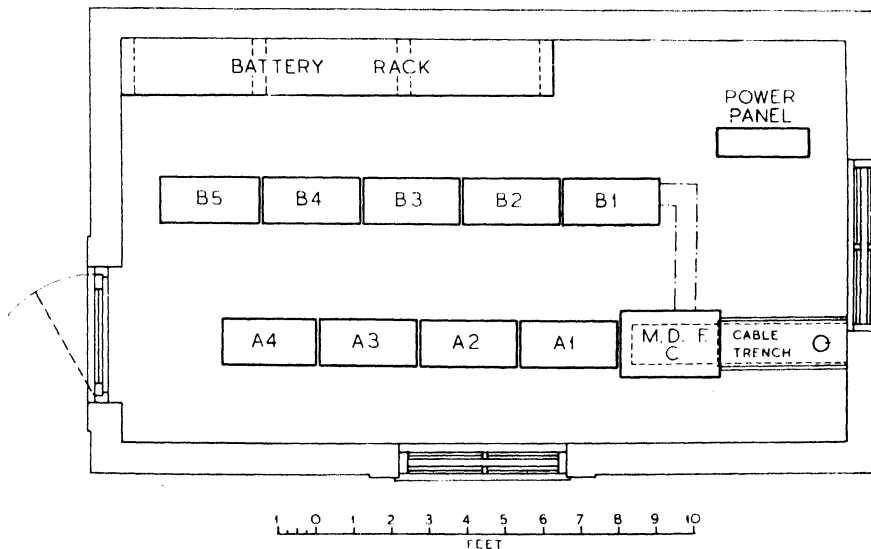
LAY-OUT OF 200-LINE EXCHANGE IN B TYPE BUILDING
